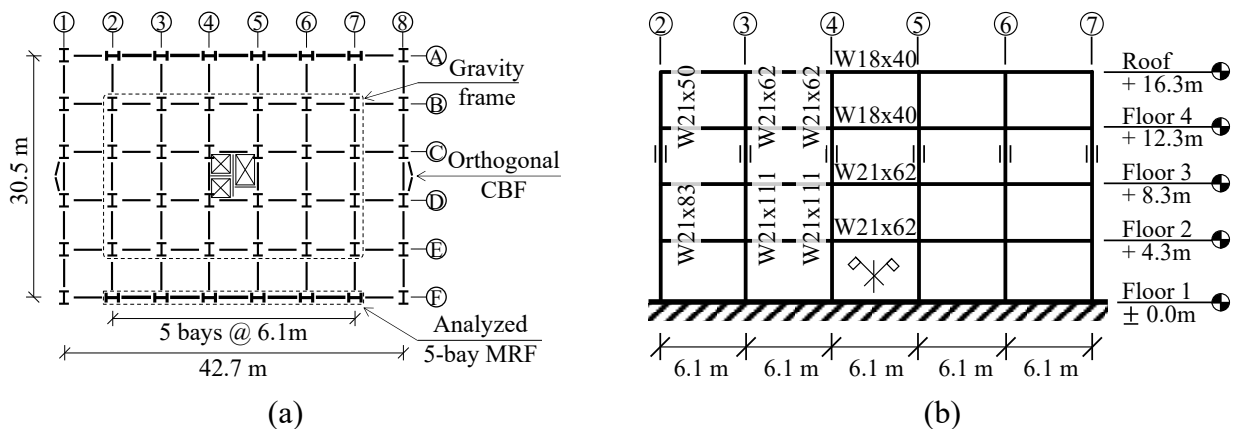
Five-bay, four-story steel MRF: (a) typical plan view; and (b) elevation view.
